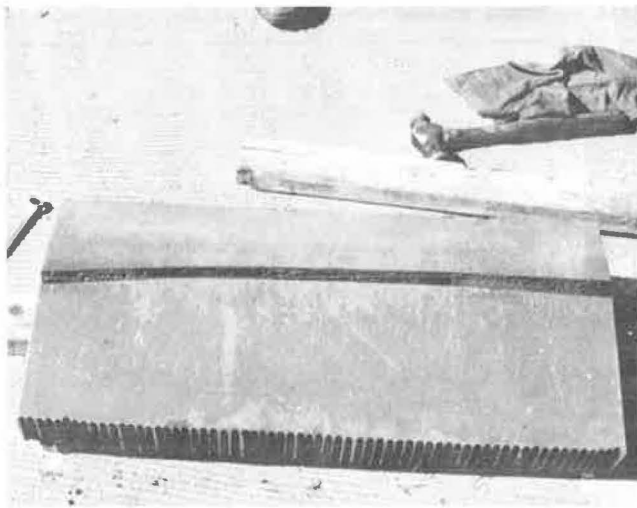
Pieces of A588 flange plate with fracture.
